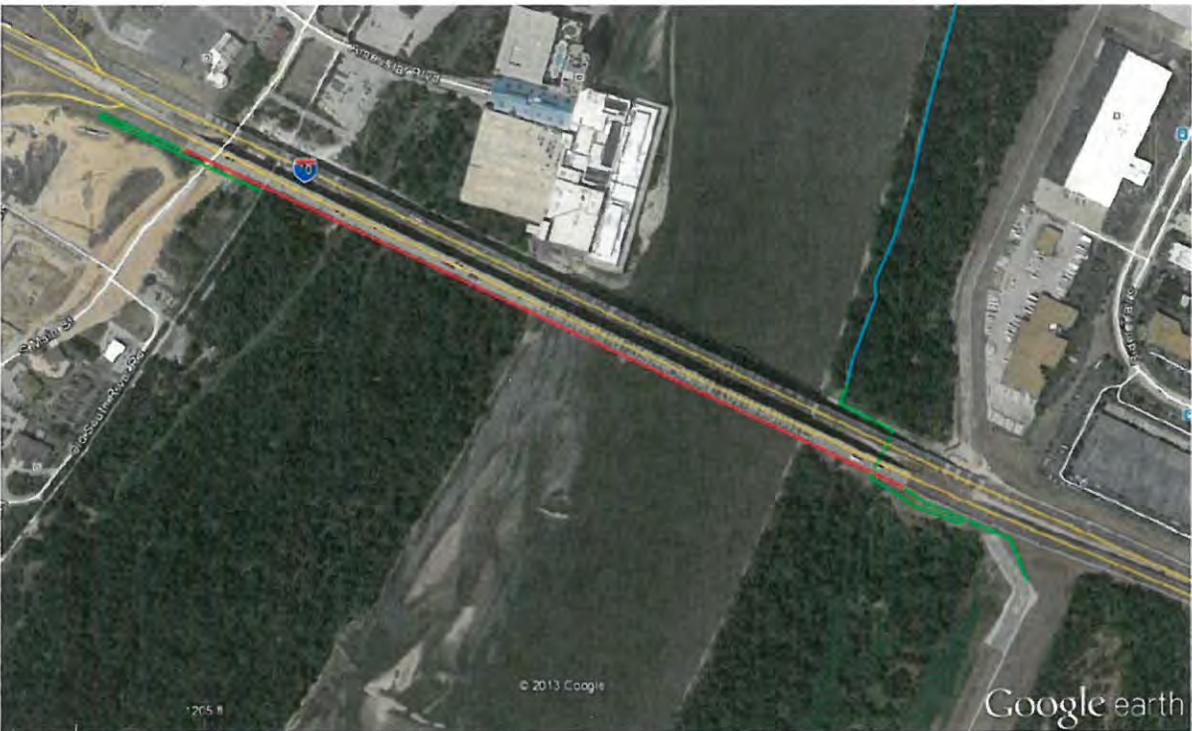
EB I-70 Bike/Pedestrian Cantilevered Attachment Pathway Layout
